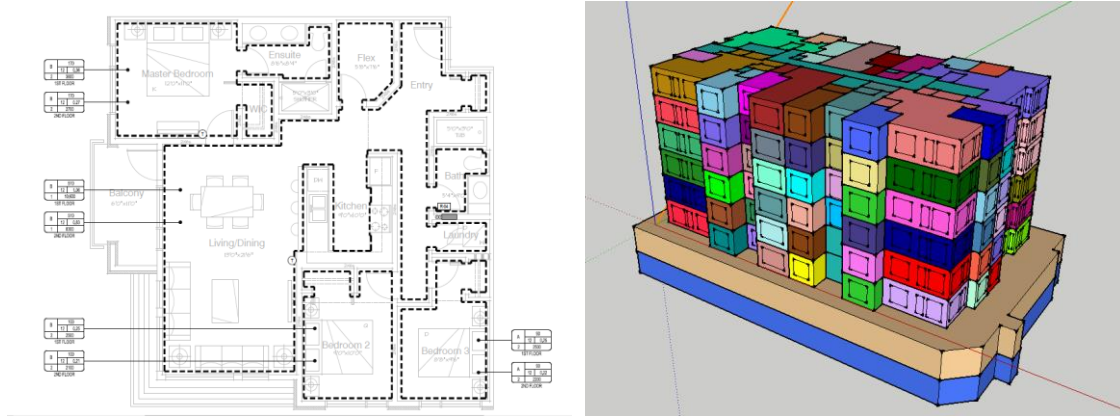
Typical unit type H floor plan (left); Model rendering by thermal zones (right)
